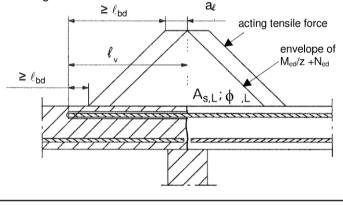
Overlapping joint at a foundation of a wall or column where the rebars are stressed in tension
